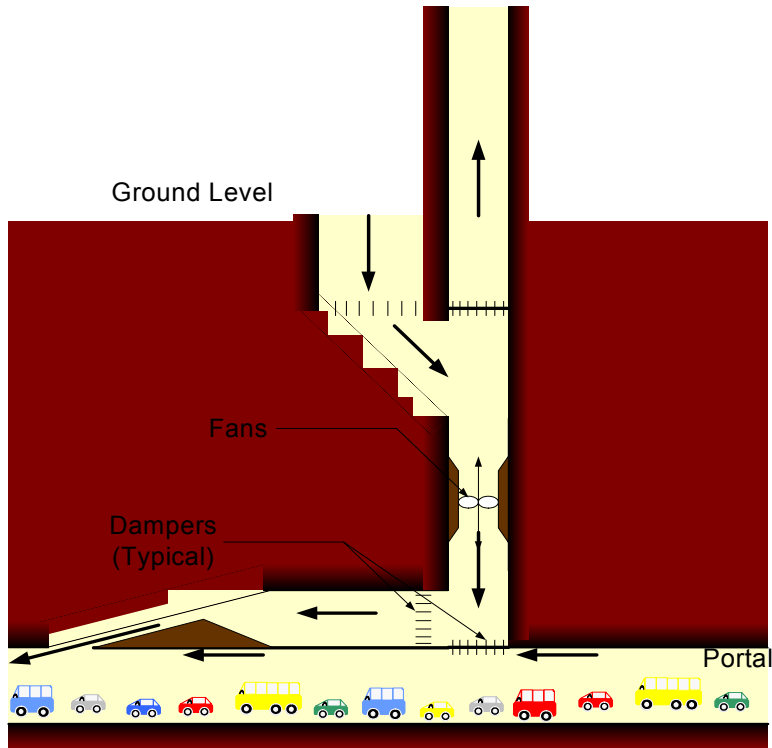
Example of a Portal Building Ventilation Arrangement for Longitudinal Ventilation using a Saccardo Nozzle
